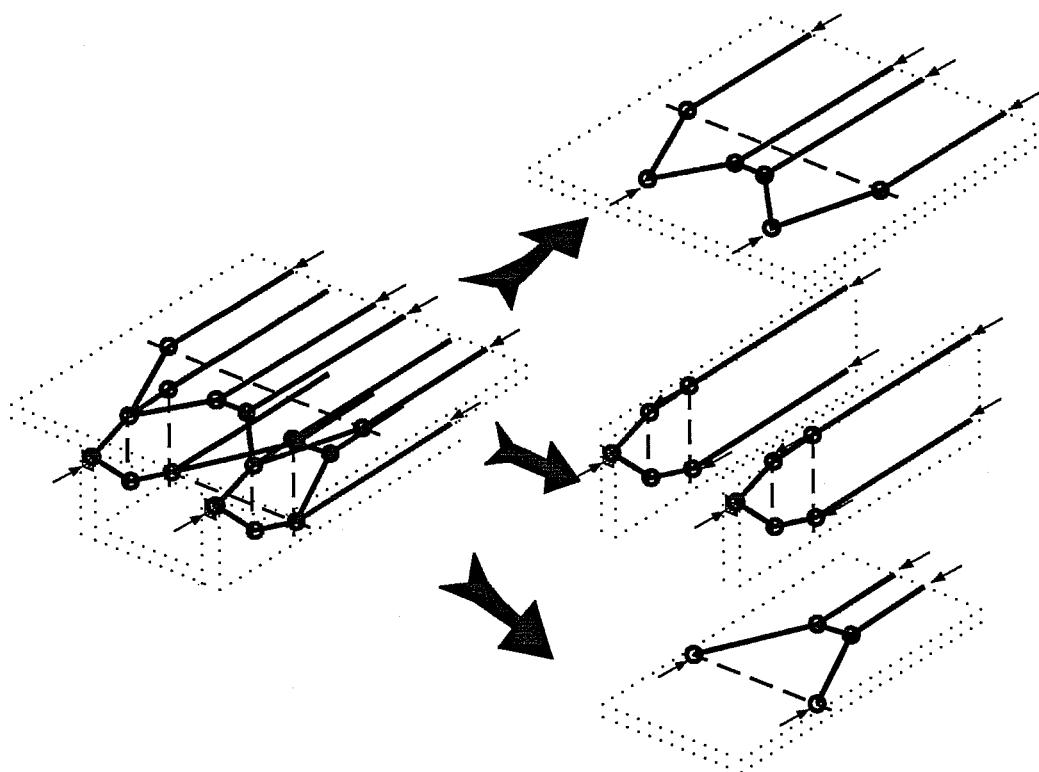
Three-Dimensional Strut-and-Tie Model of the Anchorage Zone of a Box Girder Cross Section
